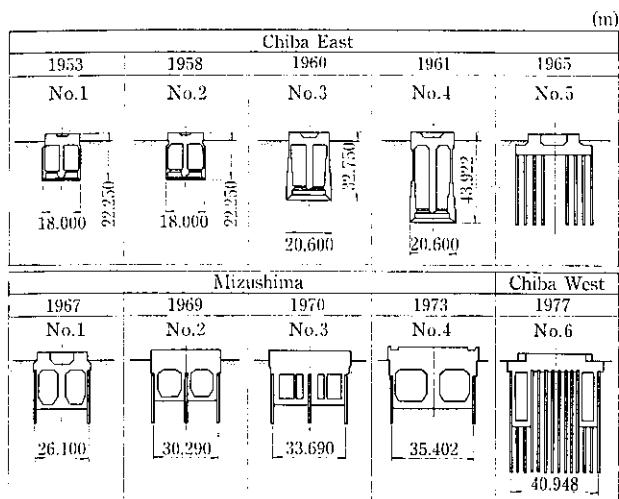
Development of blast furnace foundation at Kawasaki Steel
